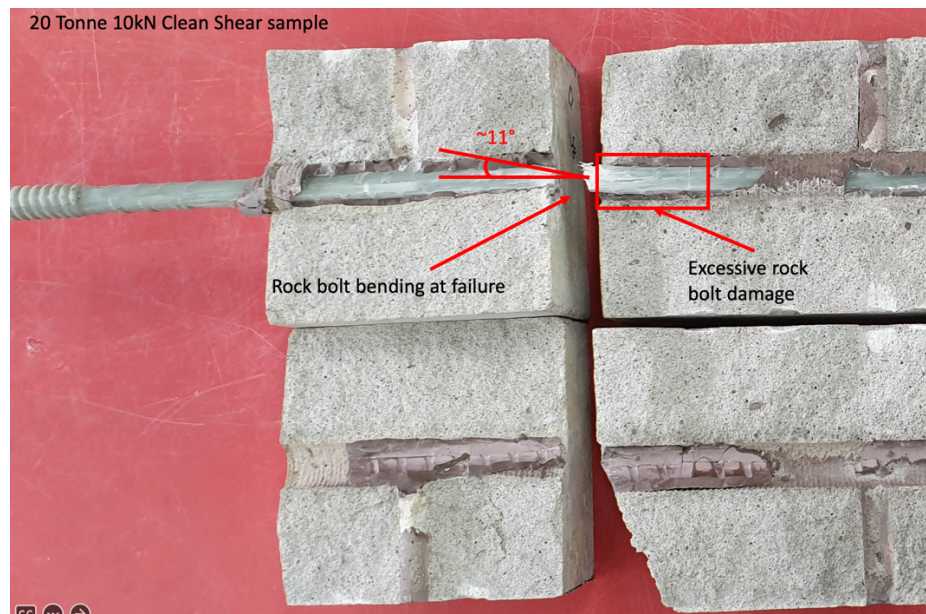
Angle of failure and rock bolt damage for 20-tonne 10kN pretension clean shear rock bolt
